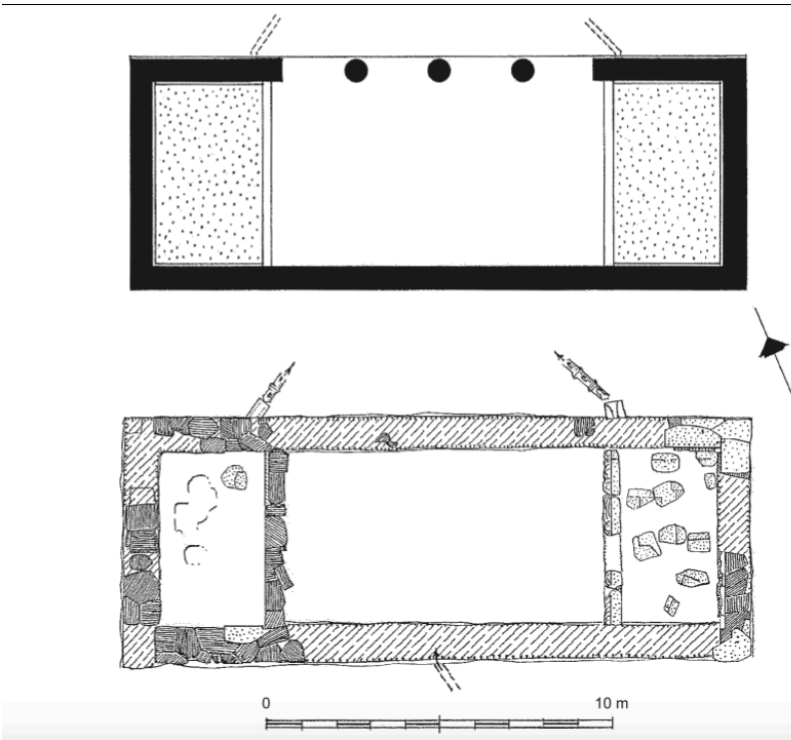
Aerial plan of the Southeast Fountain House, restored at top and current ruin at bottom. Sourced from Paga, 2015: 358.
